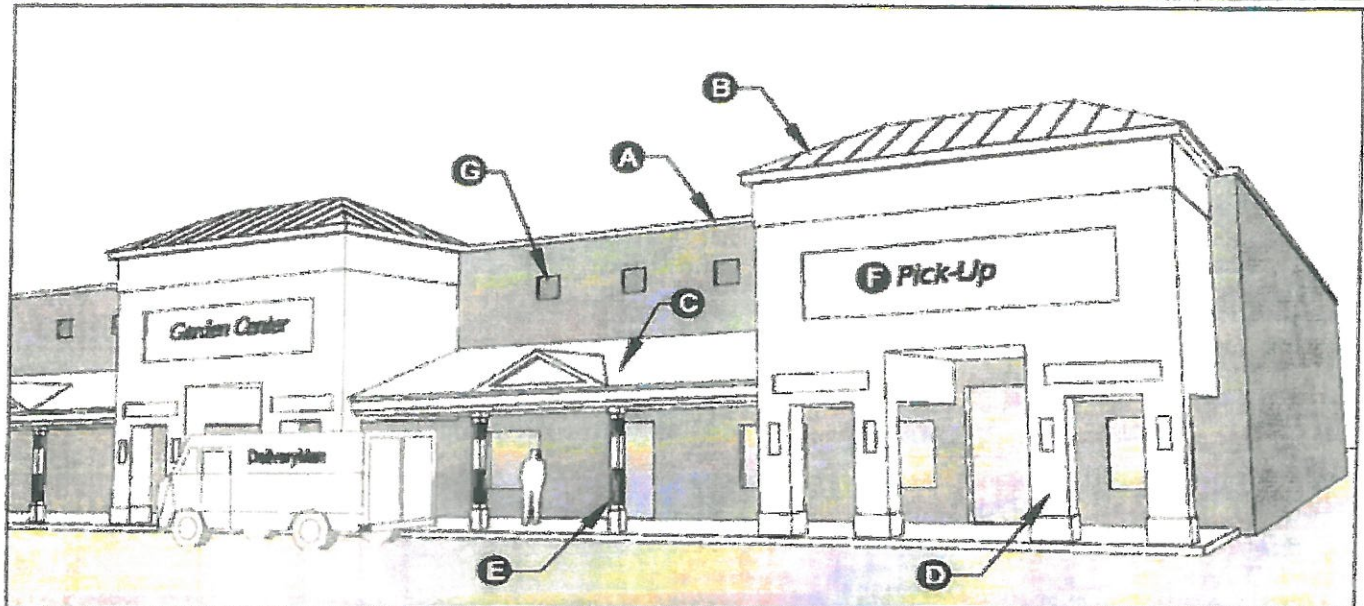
Alternate Design For Big-Box Retail. By articulating the façade of a typical Big Box retail store with different massing elements, you can help to give a smaller scale appearance to an otherwise featureless mass.
